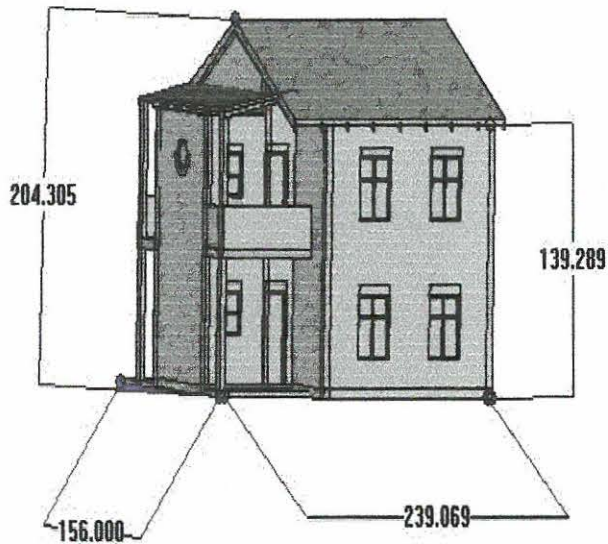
Dimension drawing of prototype (1:1) Fig. 7.29 Prototype on laser cutter (scale 1:1)
